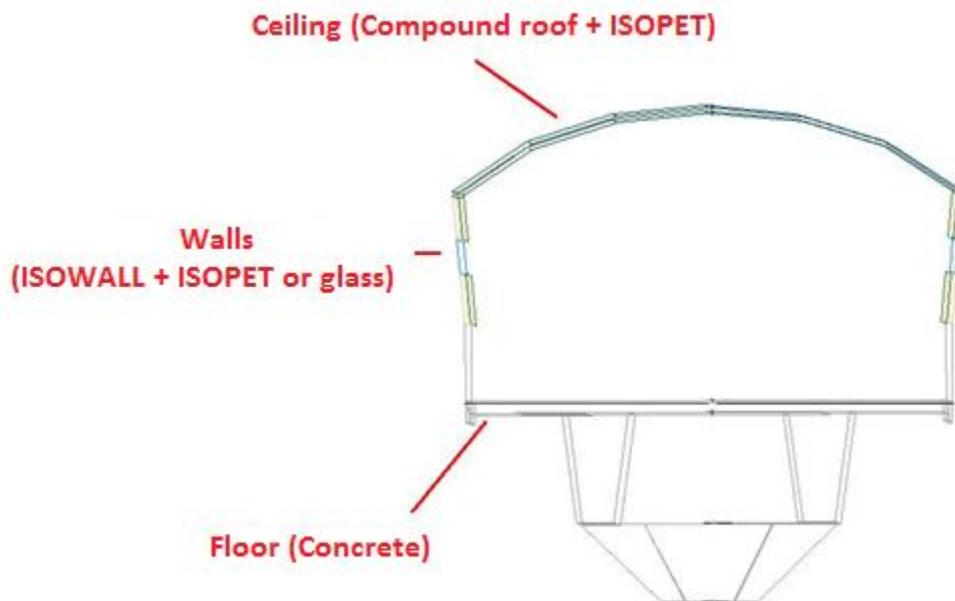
Cross section of the subway line with the acoustic barriers installed.
